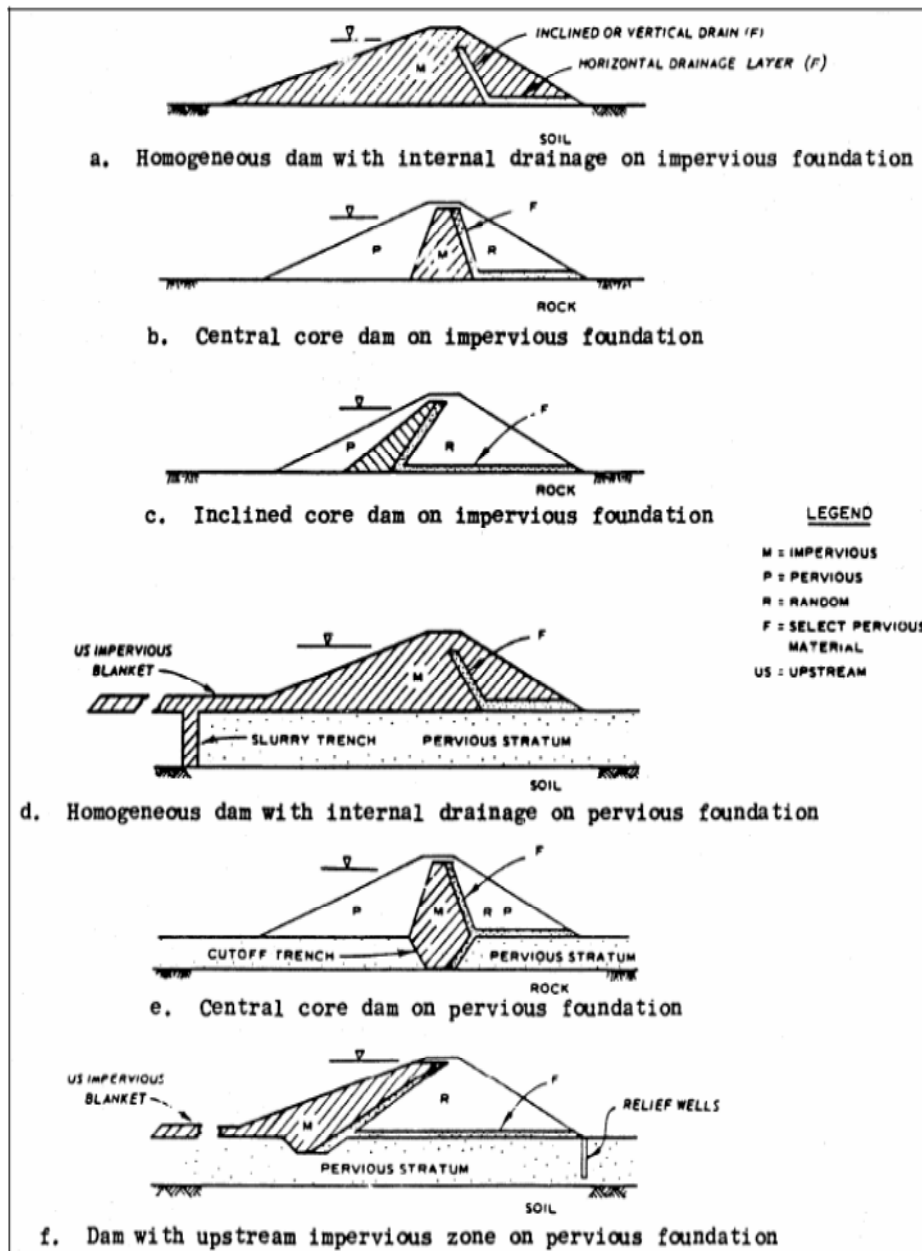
Typical Earthfill Embankment Dams (USACE, 2004)
